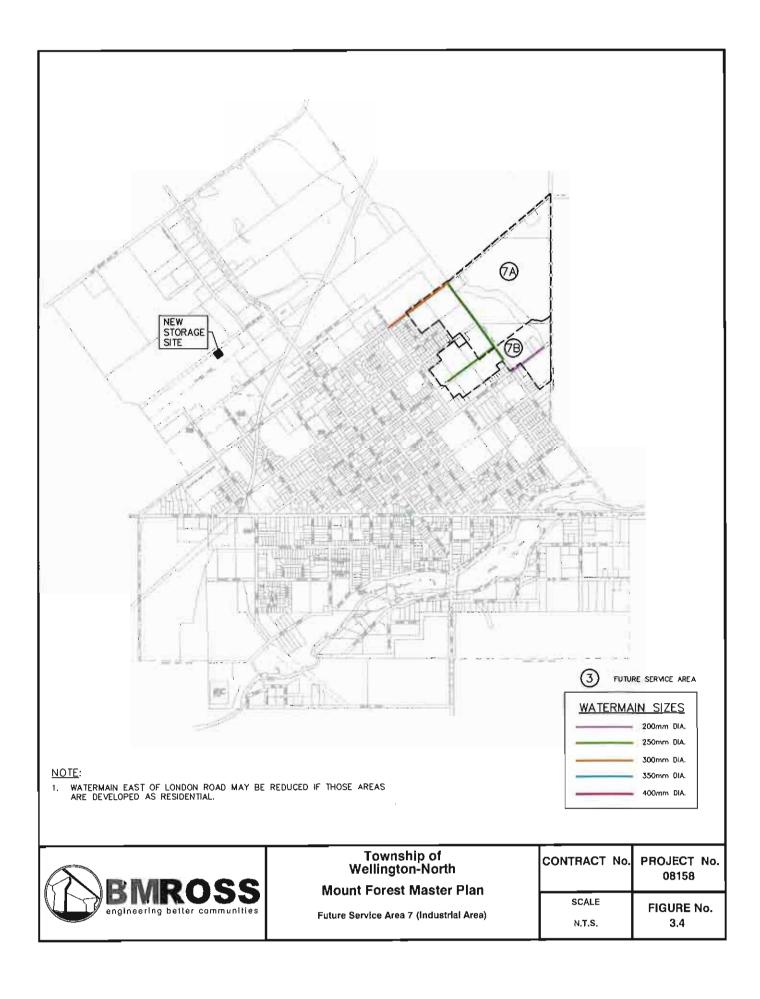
to 3.5 show conceptual layouts for future trunk watermain and the proposed location of a new elevated water tank. Where appropriate, and as development occurs, these trunk watermains could be constructed on a staged basis. Actual locations and sizes for trunk watermain must be determined at the stage of detailed design for those works. Generally, the figures are similar to those presented in the 2003 Master Plan. Below is a list of work that has been constructed since the time of the 2003 Master Plan. This represents the majority of changes to Figures 3.1 to 3.5 since the 2003 Master Plan.
